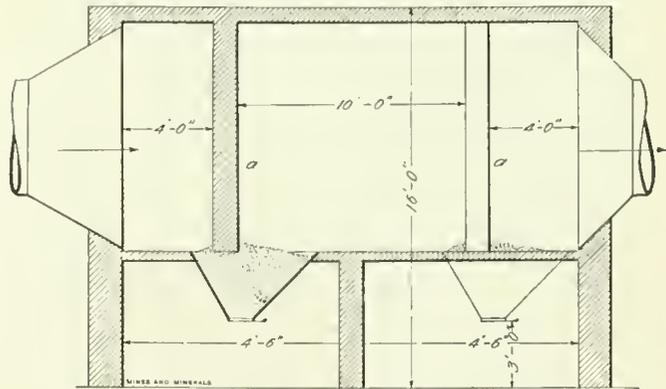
SECTIONAL ELEVATION OF FUME CHAMBER
